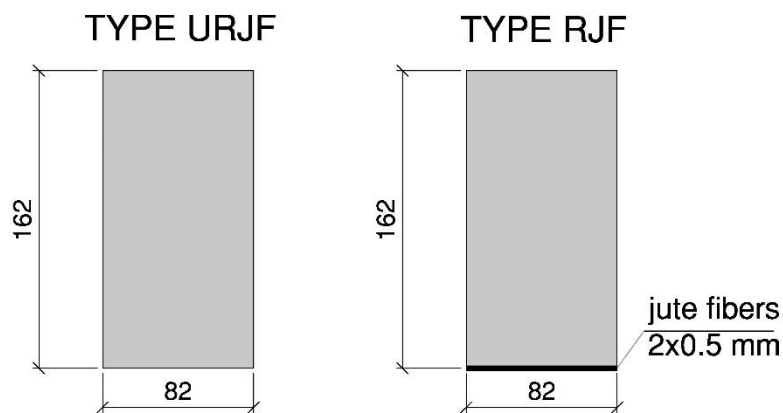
Cross-sections of tested beams [dimensions in mm]: URJF – a non-reinforced beam, RJF – a reinforced beam
